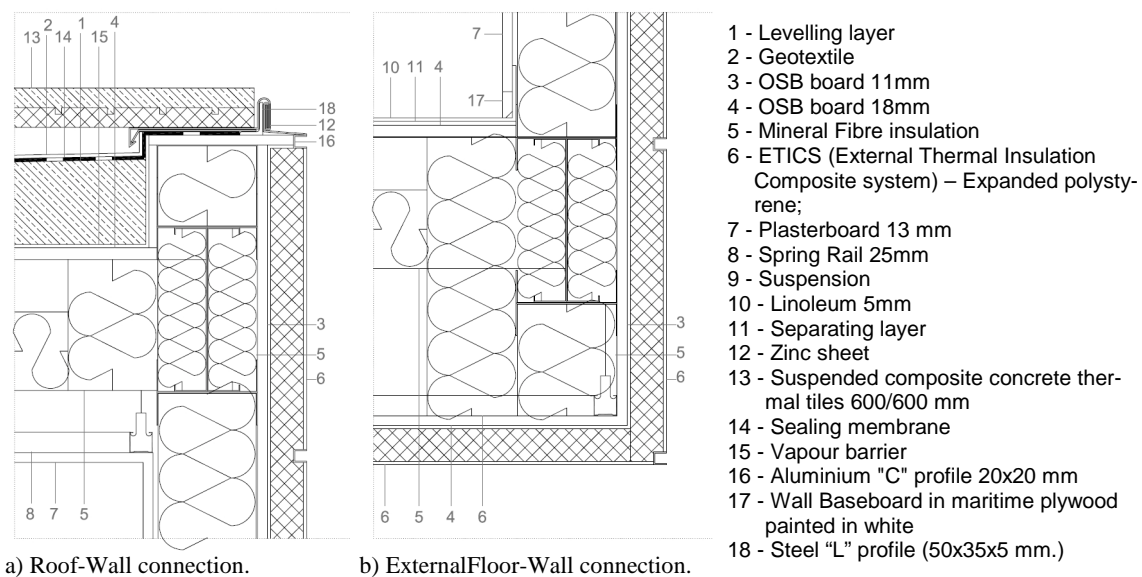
Cross-section of the building envelope main construction components (walls and slabs).
